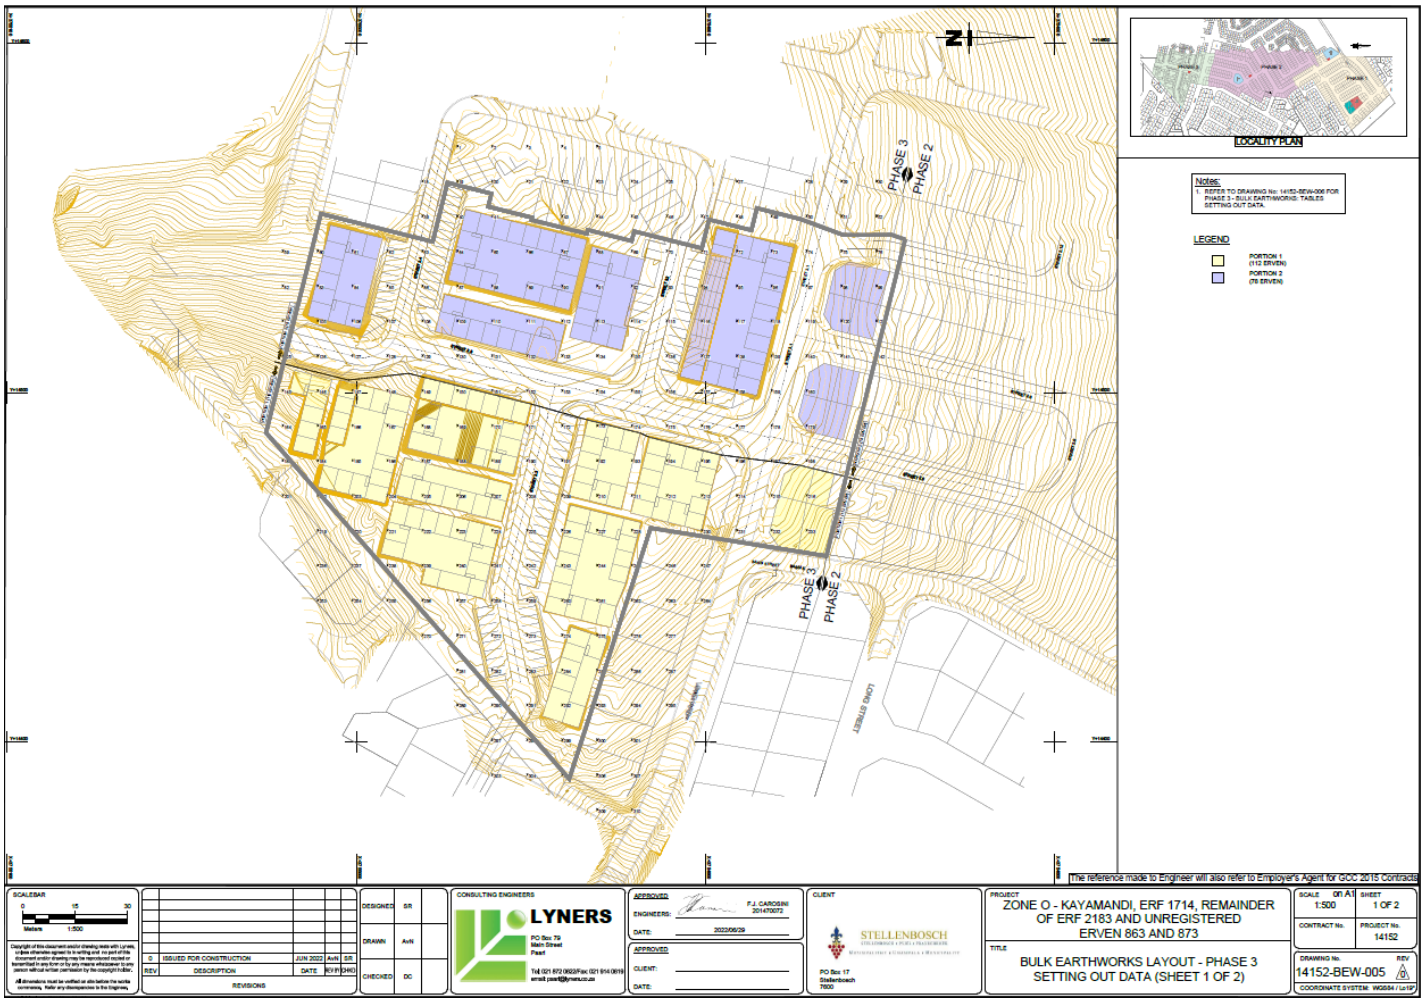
Development layout showing Portion 1 (yellow) Portion 2 (purple)
